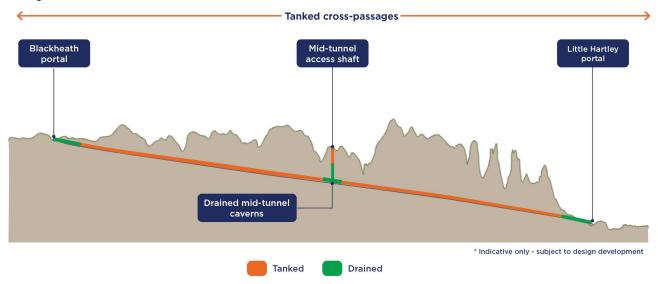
Tanked and drained sections of the tunnel and mid-tunnel access shaft
